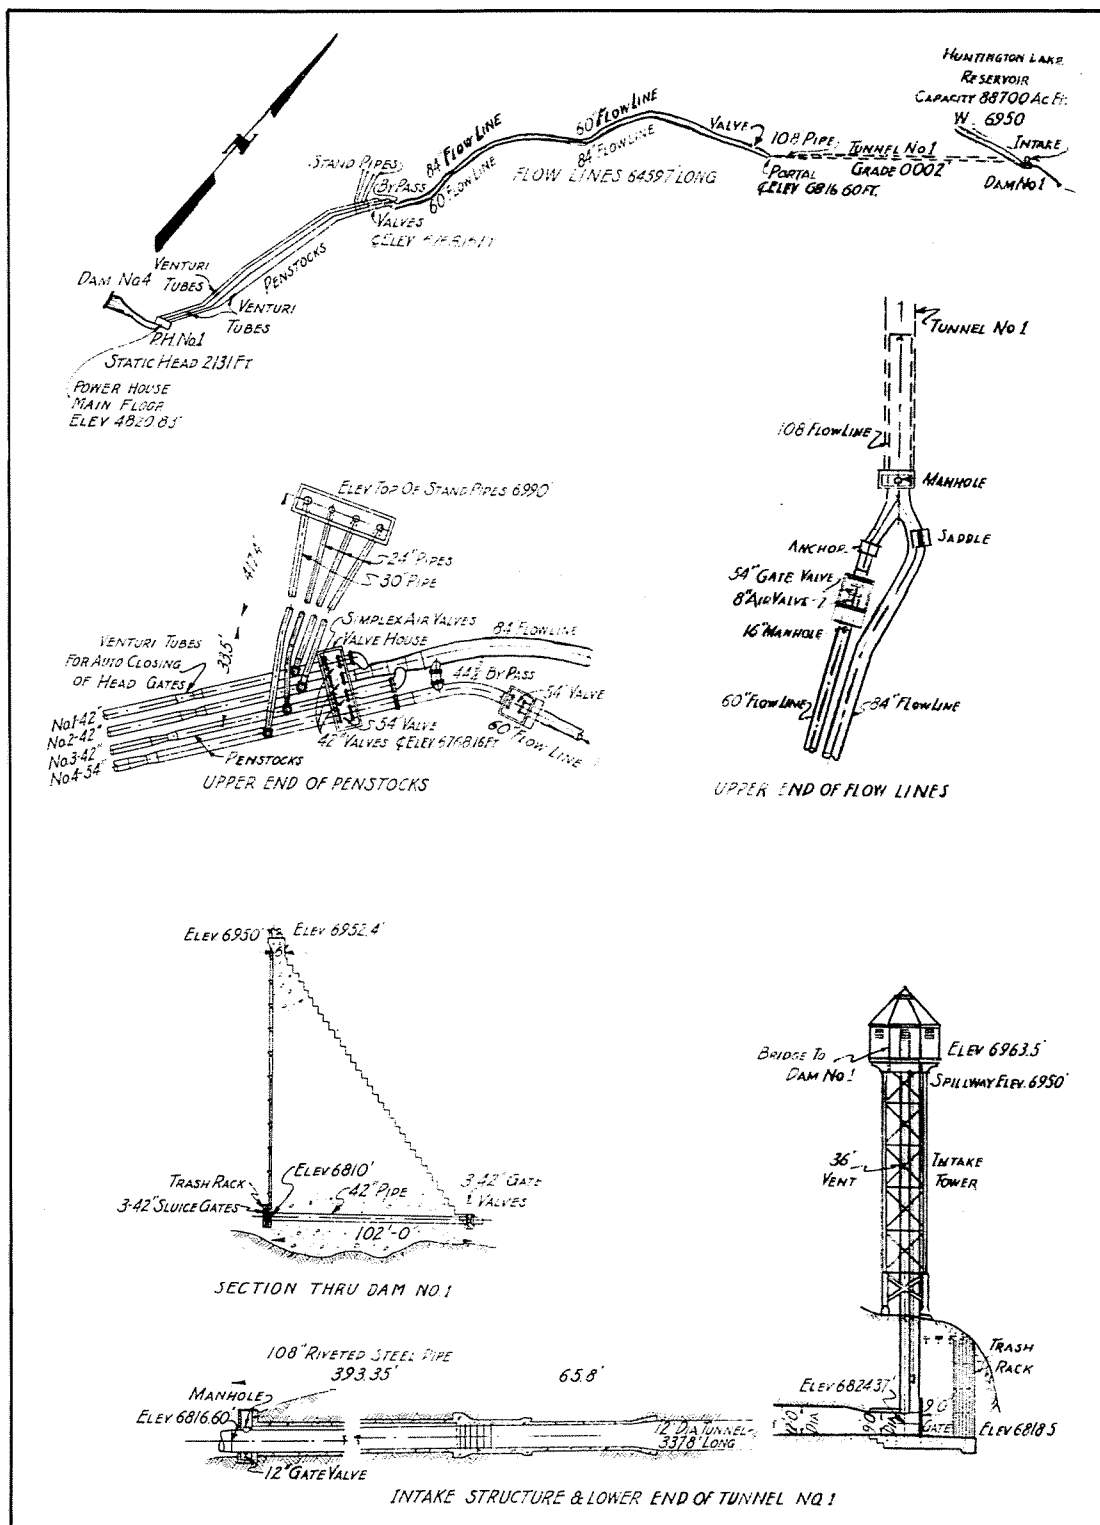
Figure A Powerhouse No. 1 hydraulic plan with details of Dam No. 1, tunnel and penstocks (SCE 1928b:B9-3).
